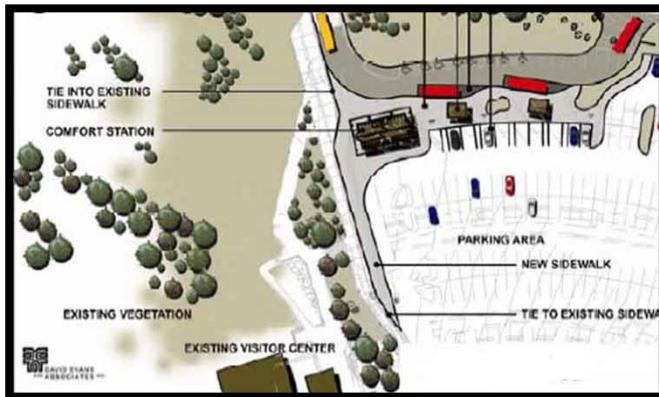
Southern-end of Parking Lot Construction concept drawing (DEA 2008).
